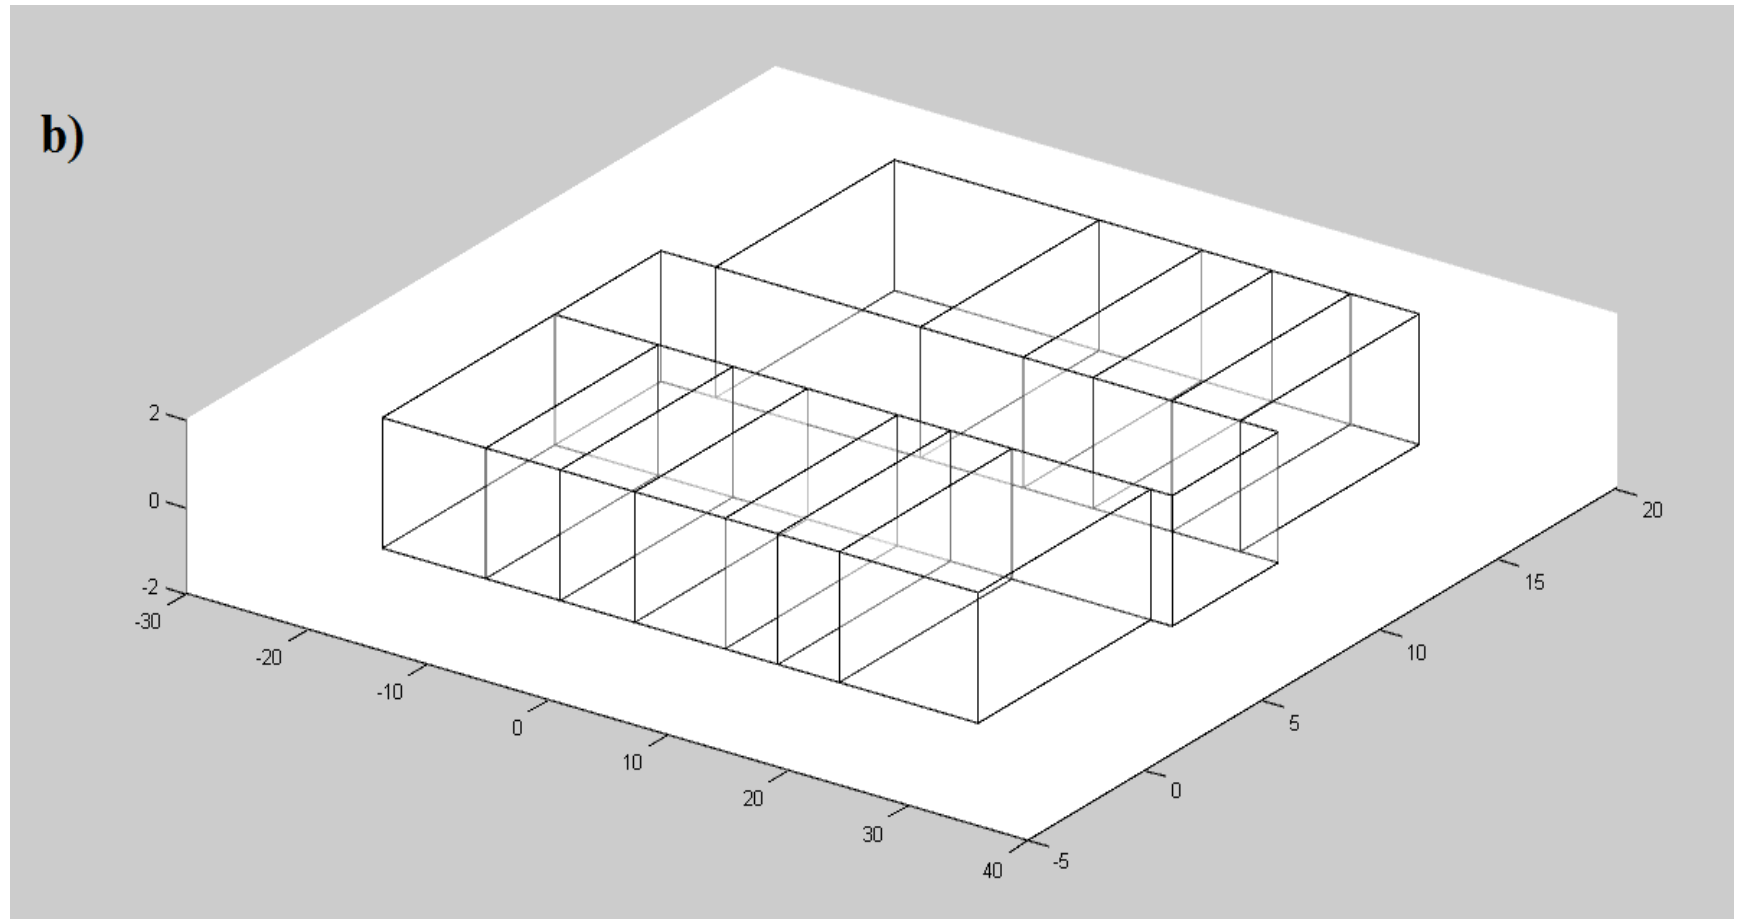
A precise geometrical model of a) 2D floor plan b) 3D floor collected by the rangefinder.
